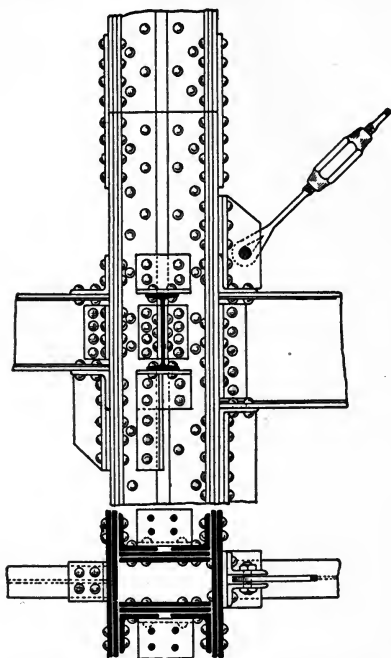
Detail of Girder and Column Connections. American Surety Co.'s Building, New York.
